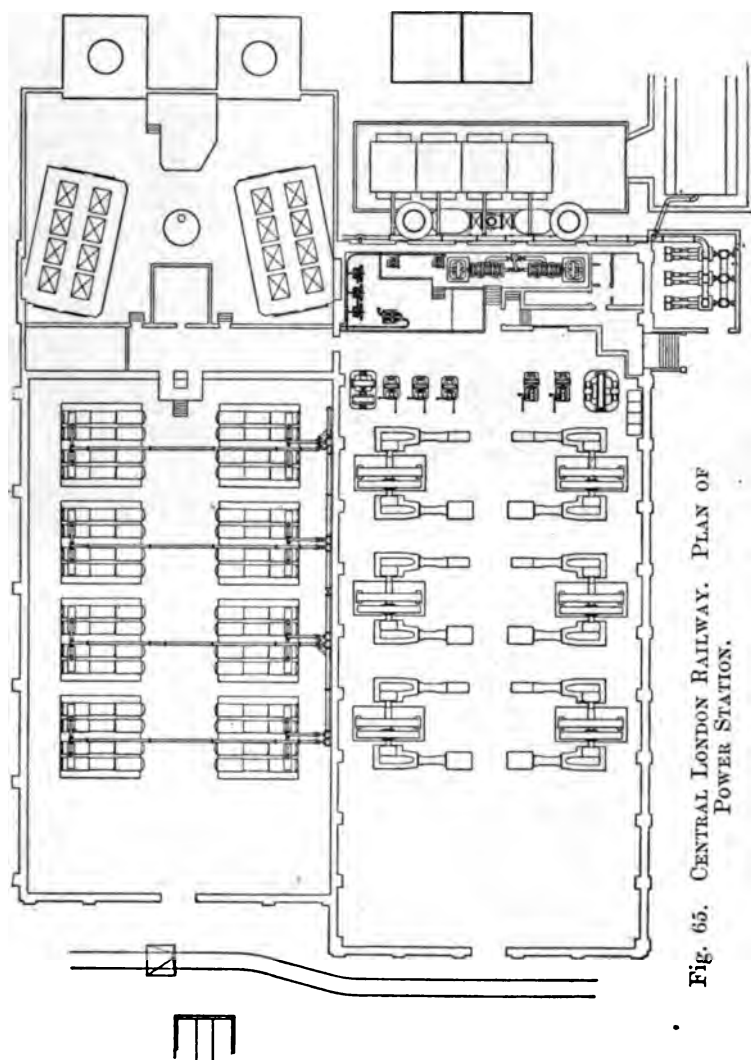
CENTRAL LONDON RAILWAY. PLAN OF POWER STATION.
